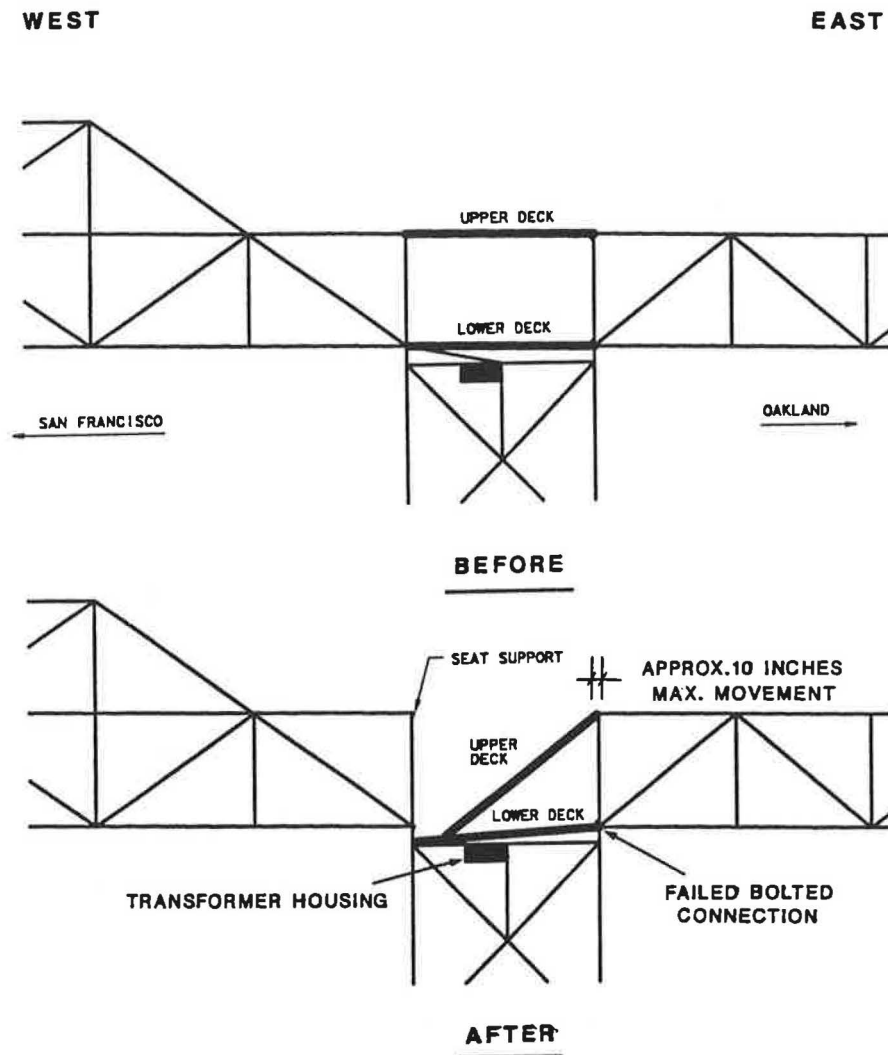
The link span at Bent E-9 in the San Francisco-Oakland Bay Bridge collapsed because of a failed bolted connection of the eastern truss to the Bent
